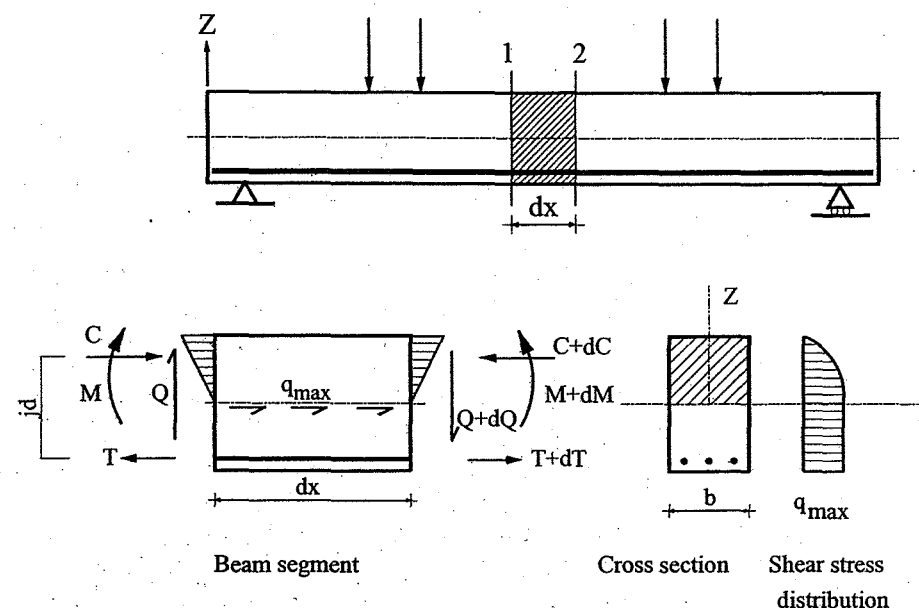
Shear stresses in cracked reinforced concrete beams
